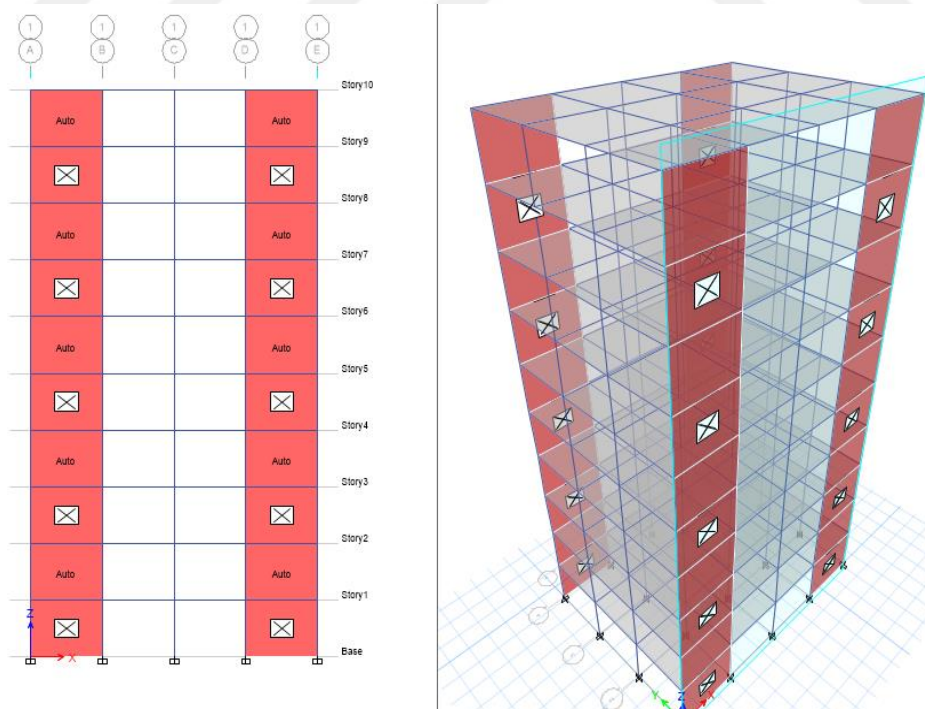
The 10-story building with concrete shear wall and with openings in the odd stories.
